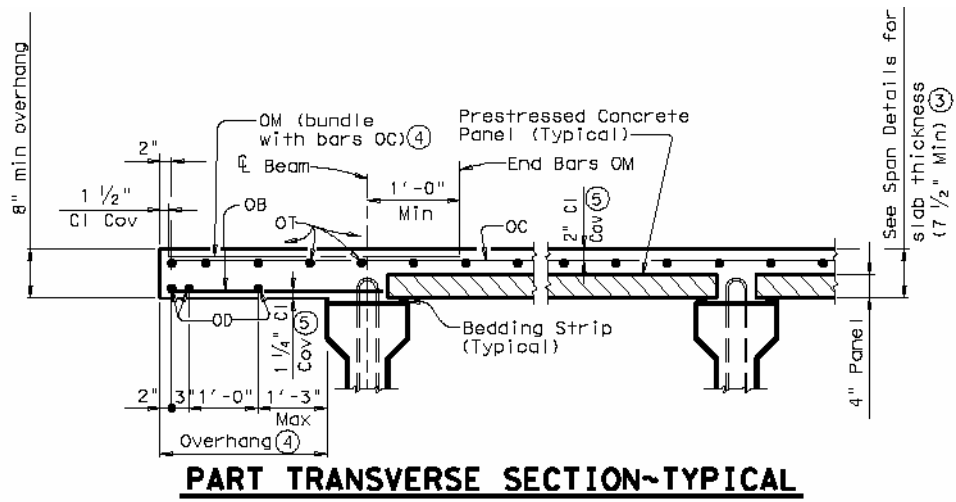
Precast Concrete Partial-Depth Deck Panels Used by TxDOT
